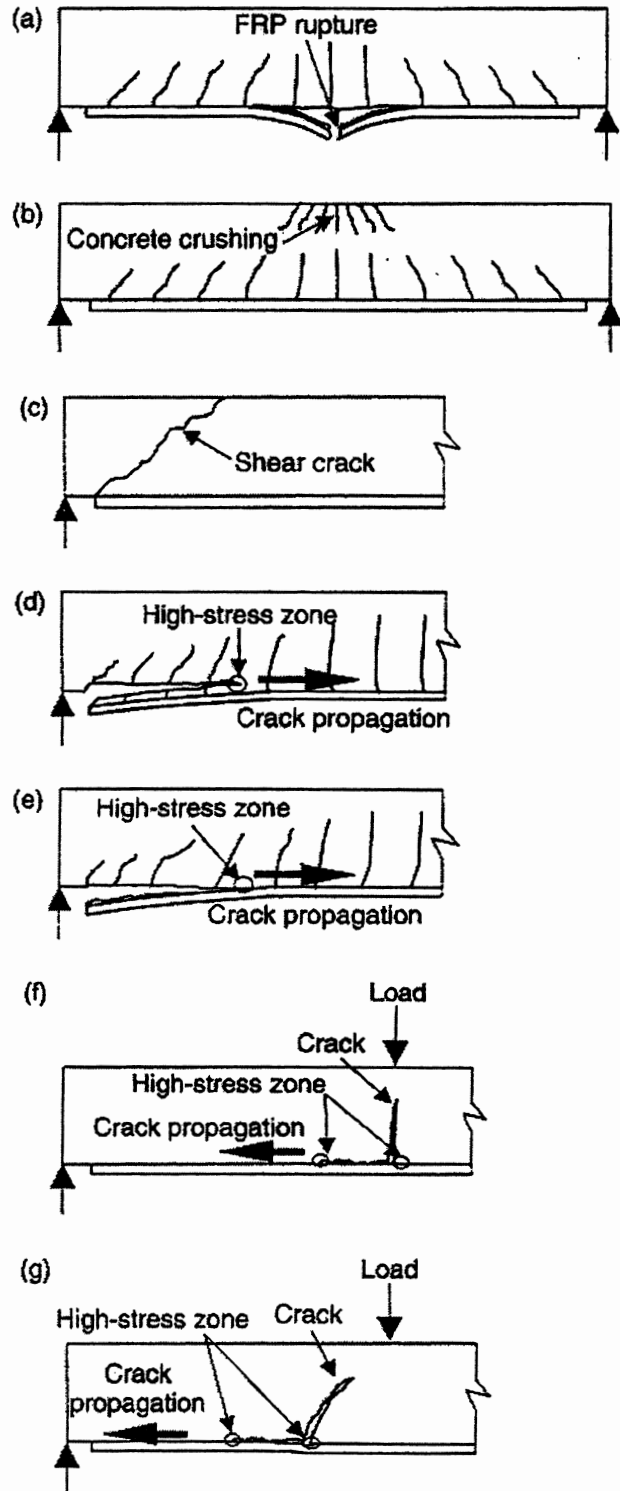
Flexural Failure Modes for FRP Strengthened Beams (Teng et al. 2002)
